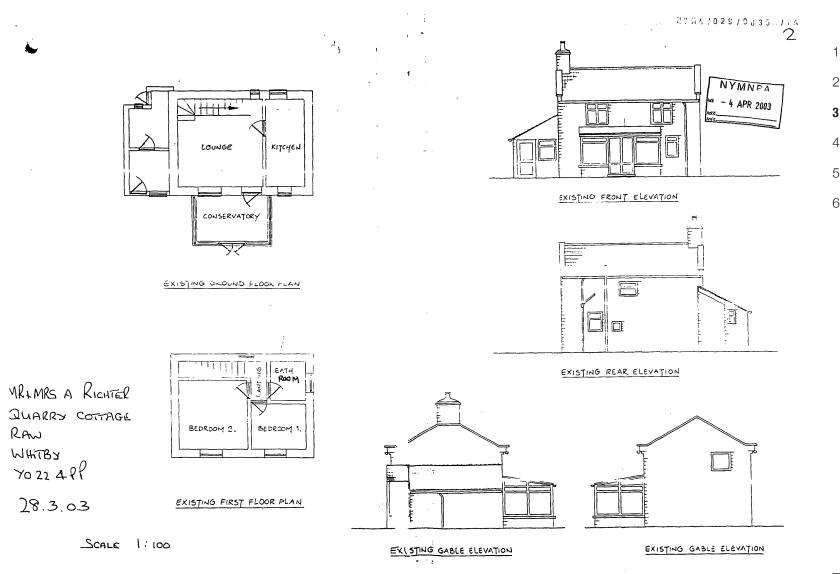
Application 40290035A. Existing plans and elevations submitted for application 40290035A. With reference to the earlier approval, note that according to this drawing the chimney stack to the north east elevation has been removed but the kitchen window has not been enlarged.
